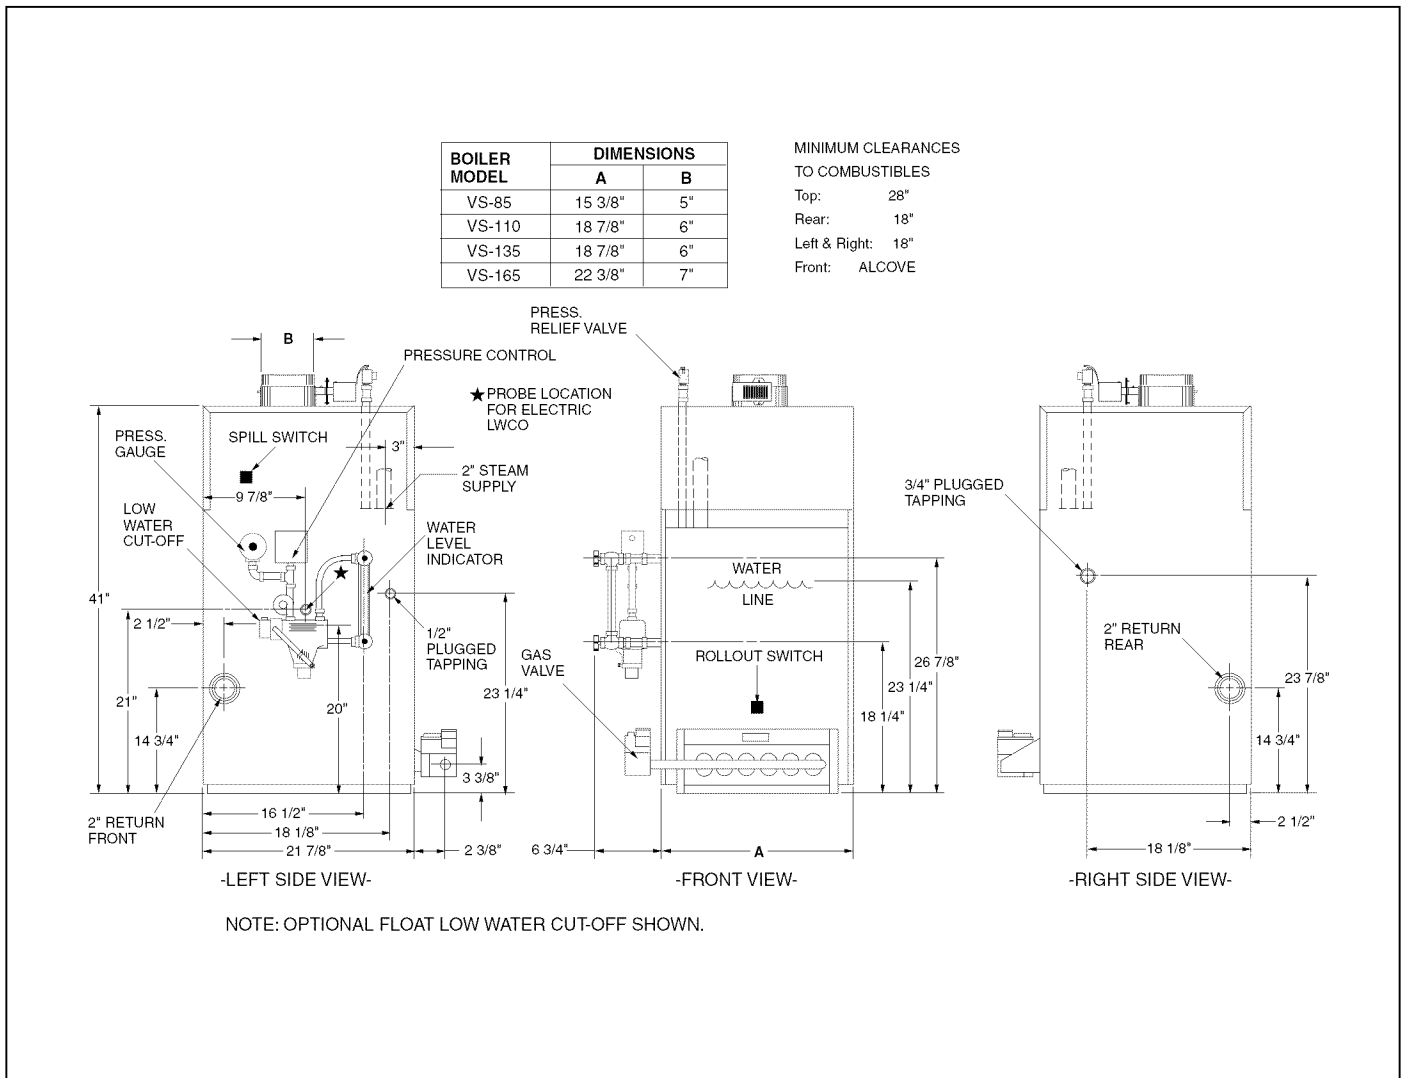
MODEL VS-B BOILER DIMENSIONS
